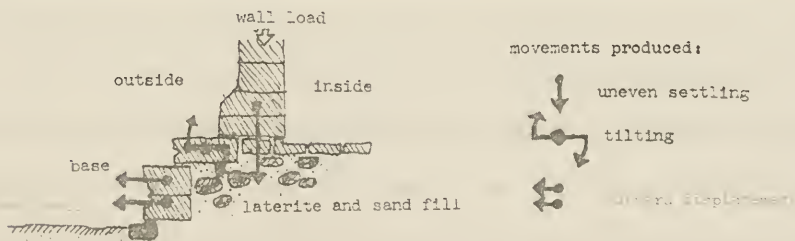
Sketch of structural failure due to unequal support of the foundation.
